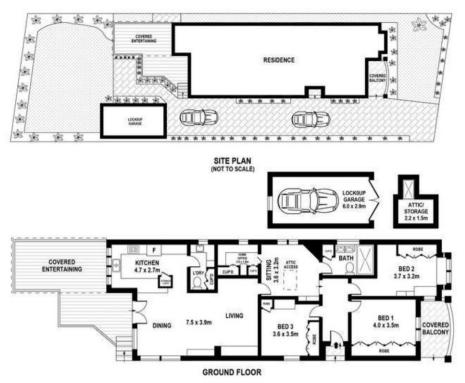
Site Plan and Ground Floor Plan of existing dwelling.
